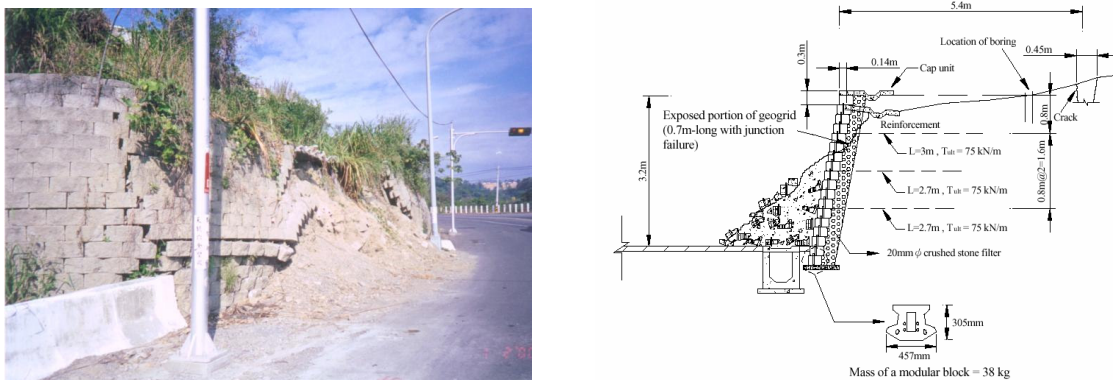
Failure Photo and Schematic Drawing of Da-Kung Wall (after Huang and Tatsuoka, 2001).
